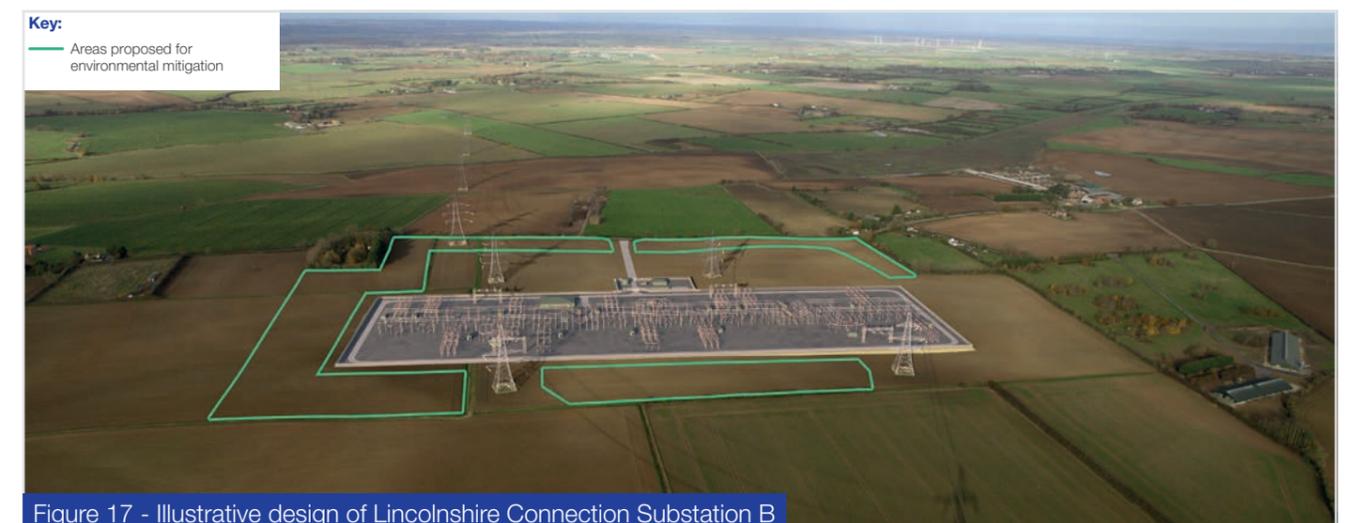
Illustrative design of Lincolnshire Connection Substation B
